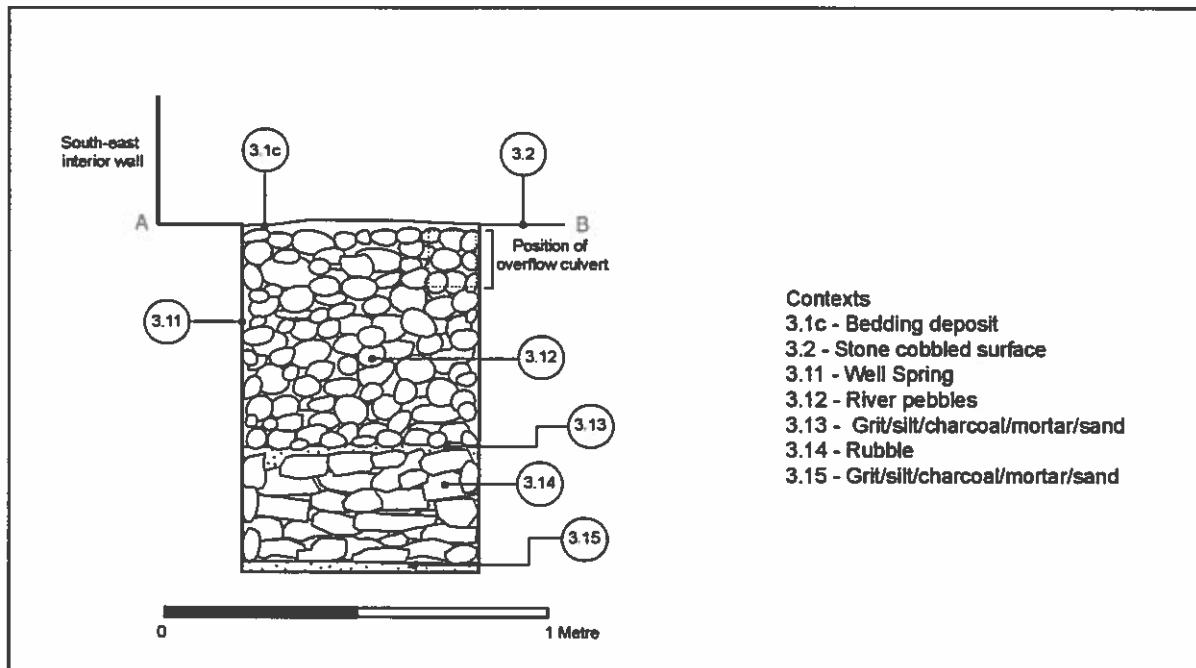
North facing section through Well/Spring showing fill and position of overflow culvert.
